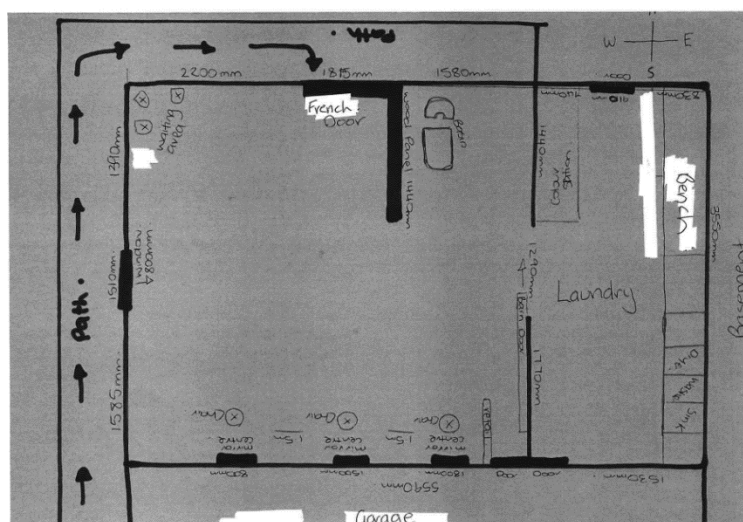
Proposed layout and access of hair salon (Source: Applicant Application)
